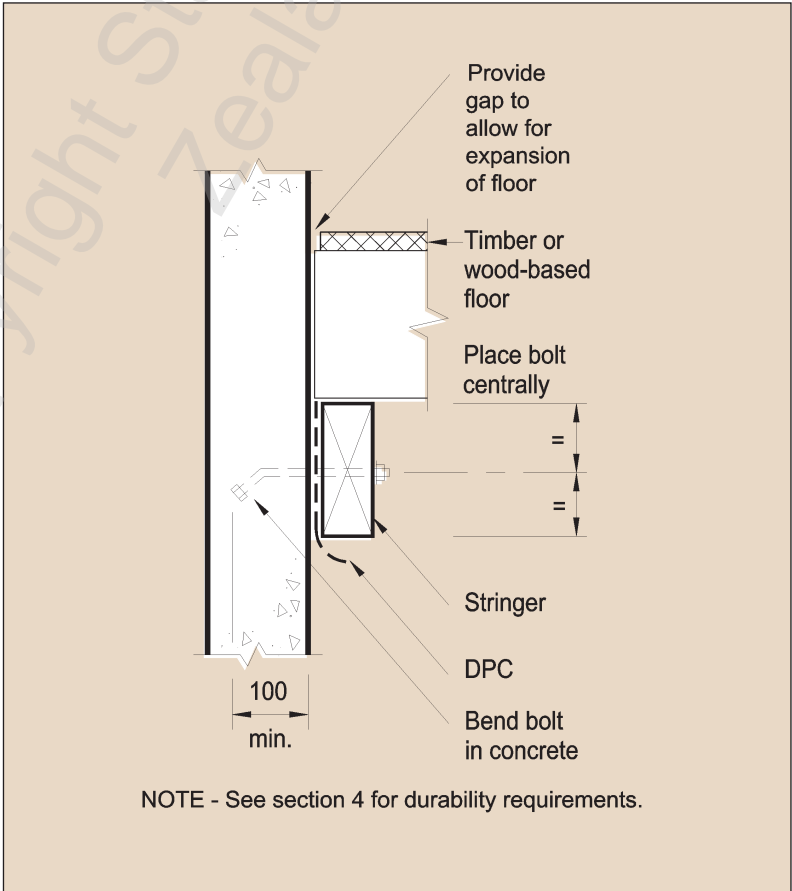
Fixing of stringers to foundation walls (see 6.13.2)
